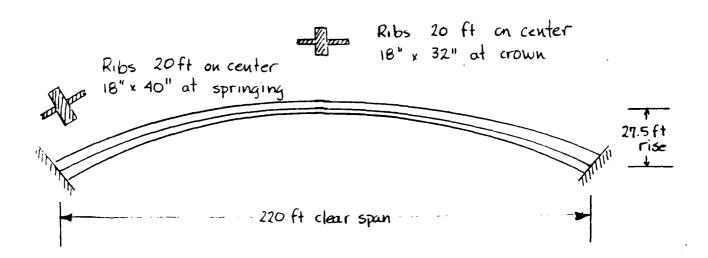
Longitudinal and transverse sections of the 220 ft span hangar model
